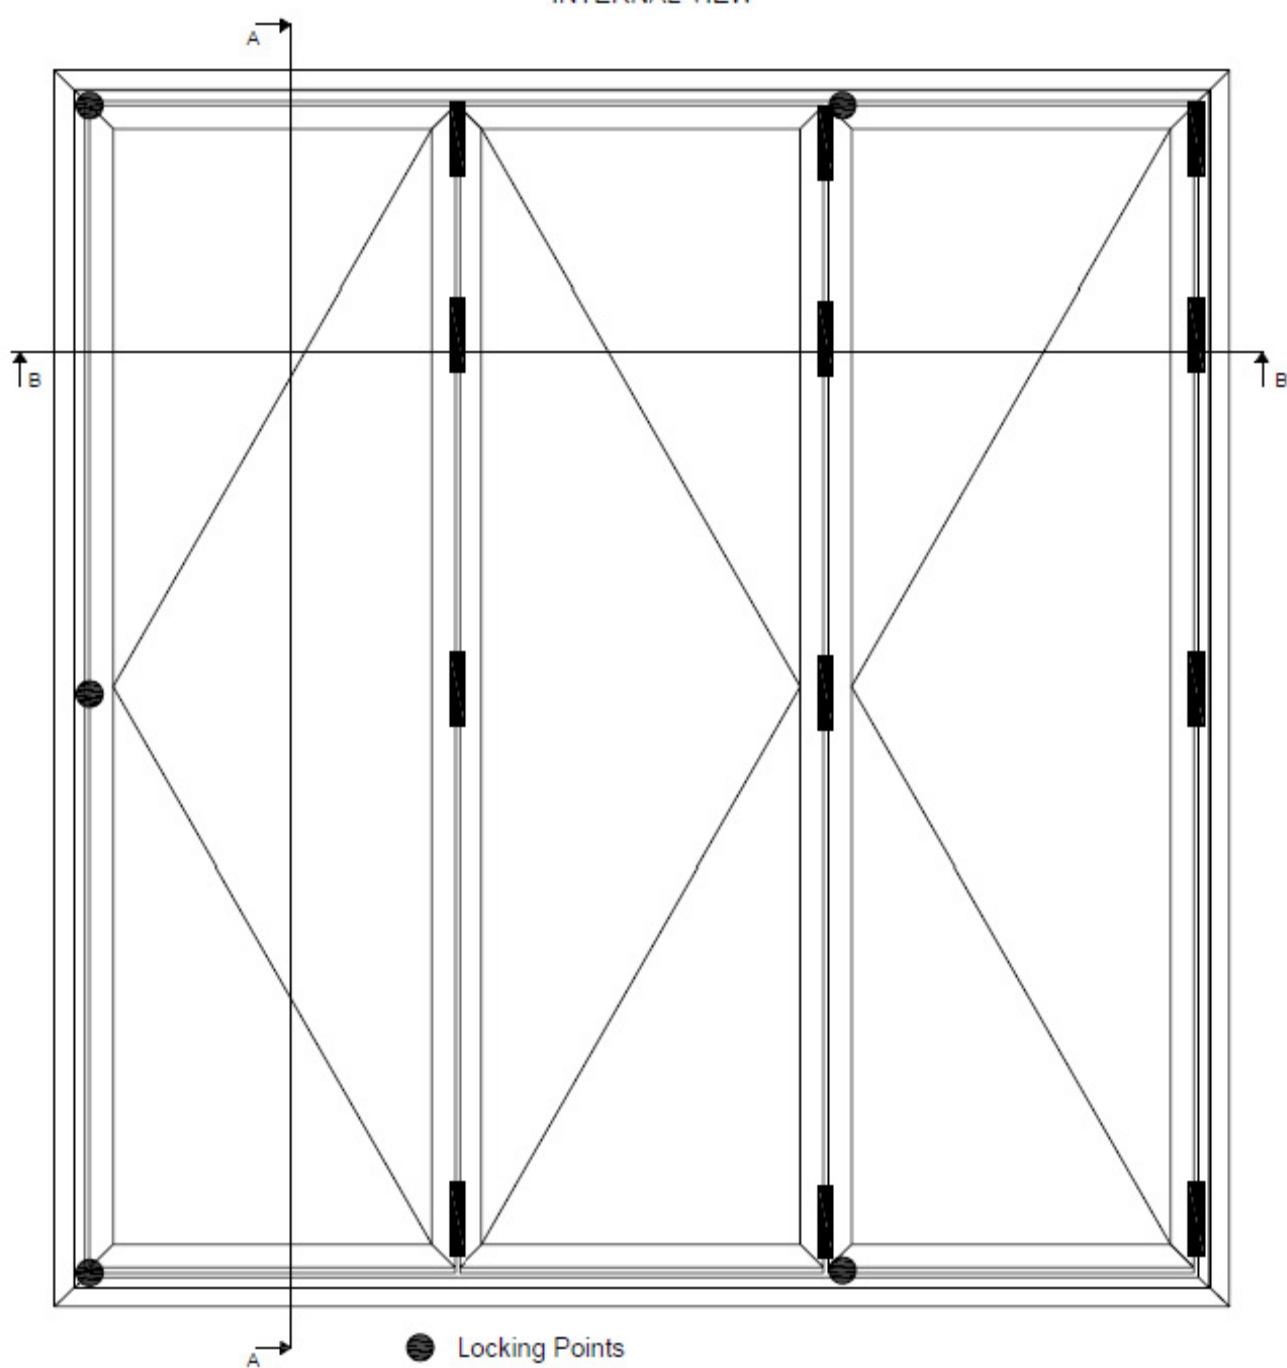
Front view of the received and tested sample, positioning scheme of locking device: front view
